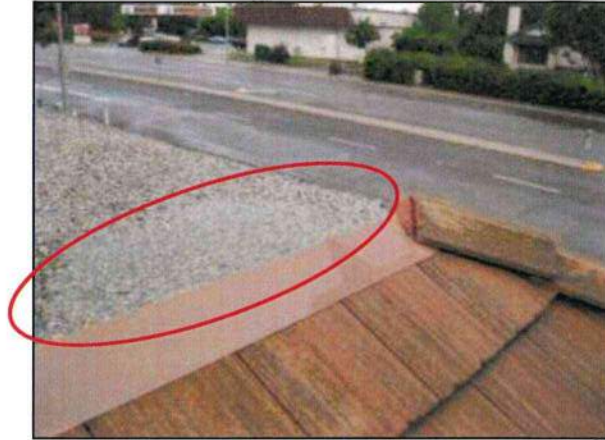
Fire Station #4 Standing water was noted on the flat portion of the roof at the time of the inspection.
